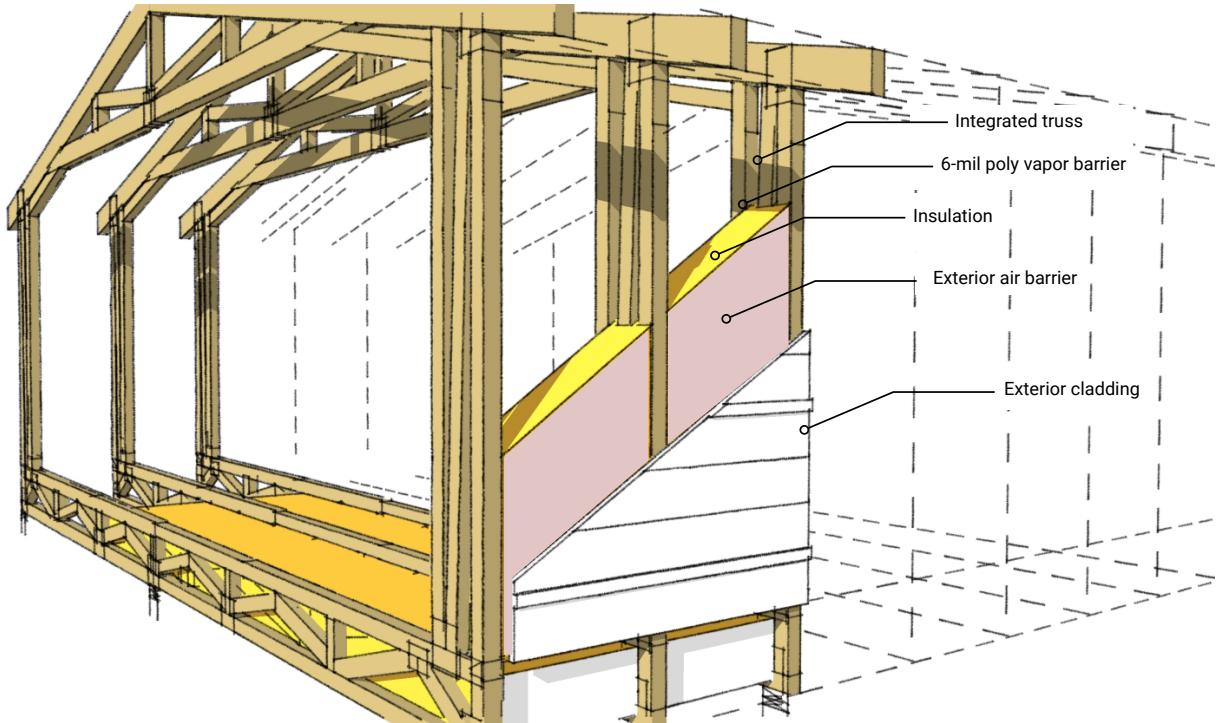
The integrated truss wall assembly incorporates roof, wall, and floor components into a single building component. The wall truss geometry calls for a thickness that can easily accommodate high-performance levels of insulation
